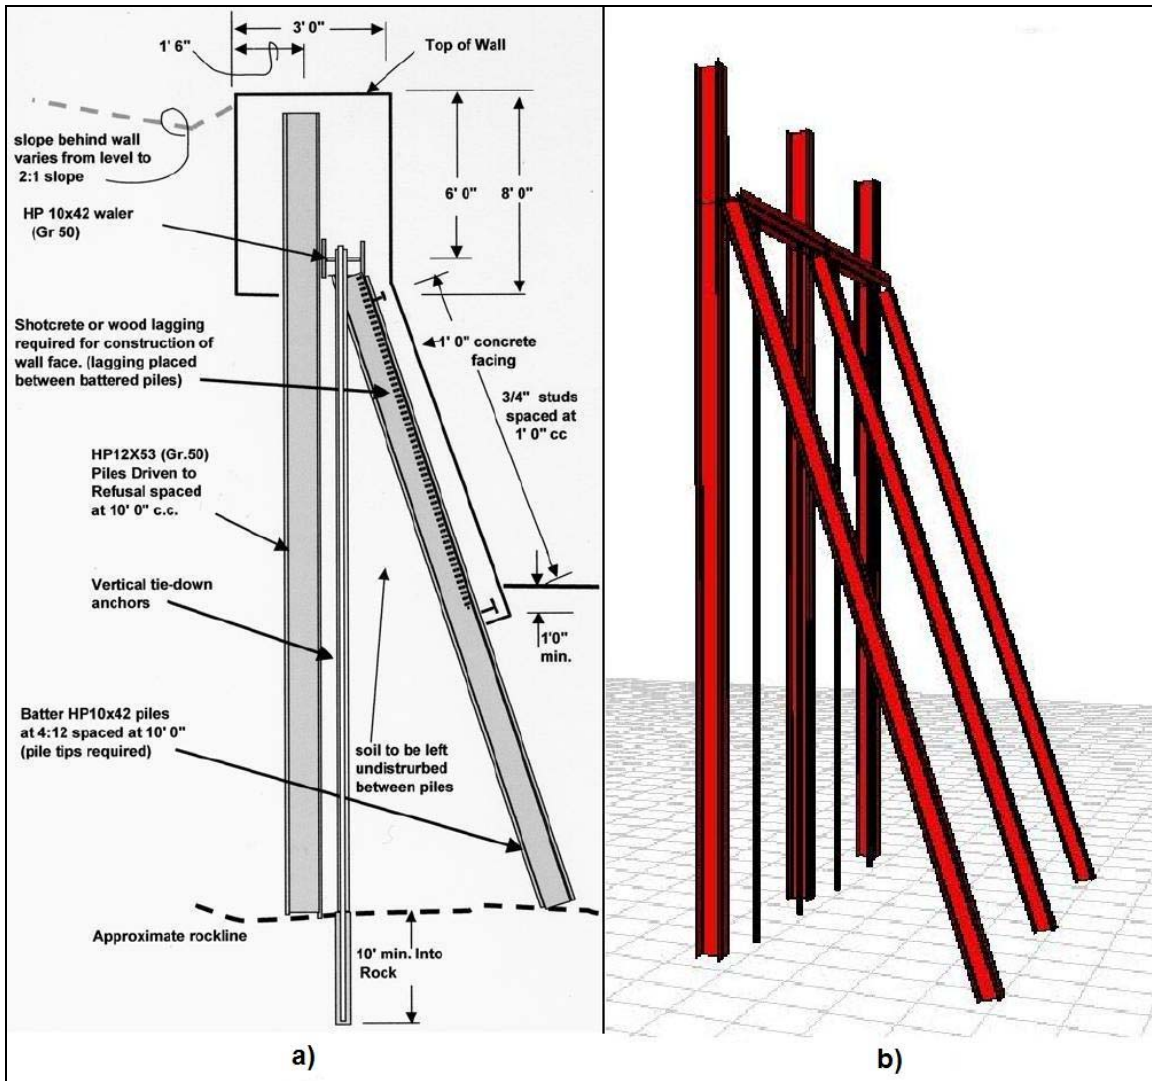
a) Cross Section of Wall (Pate and Haddad, 2007) b) 3D Schematic
